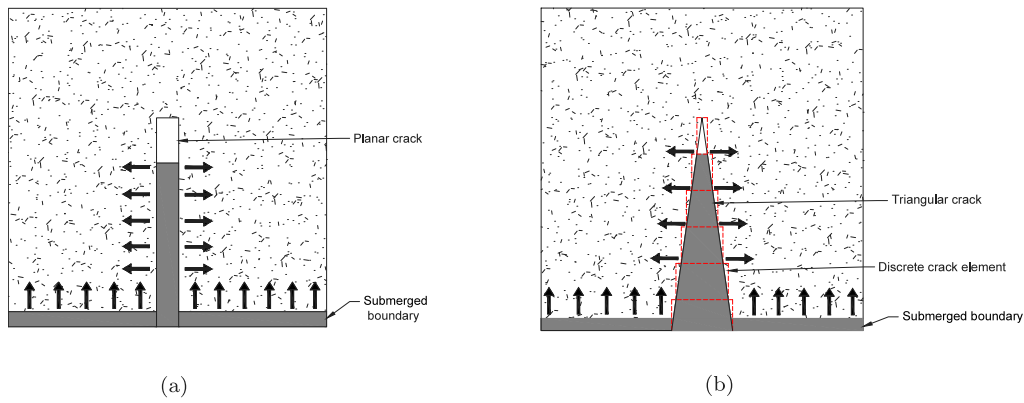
Capillary suction in the crack: (a) planar crack; (b) V-shaped (tapered) crack.
